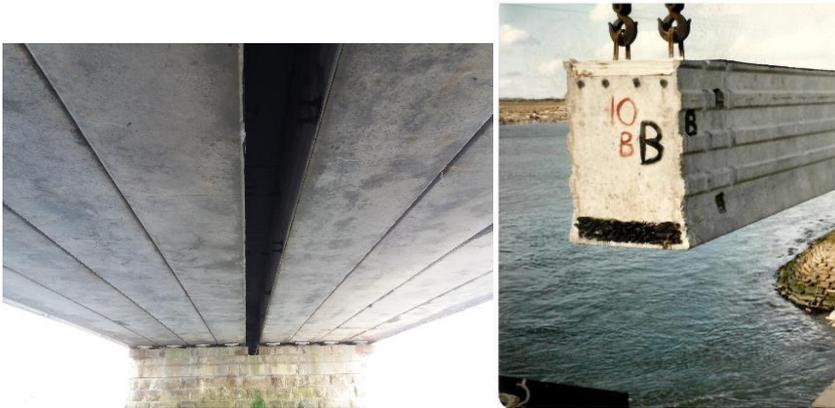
UBB36 Erection of precast beams (left) and soffit (right) (Source IÉ)
